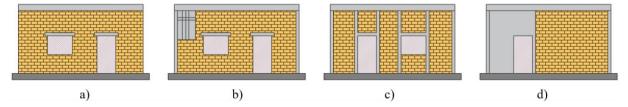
Structural types of masonry building: a) unreinforced masonry, b) reinforced masonry, c) confined masonry, d) reinforced concrete frames and masonry wall
